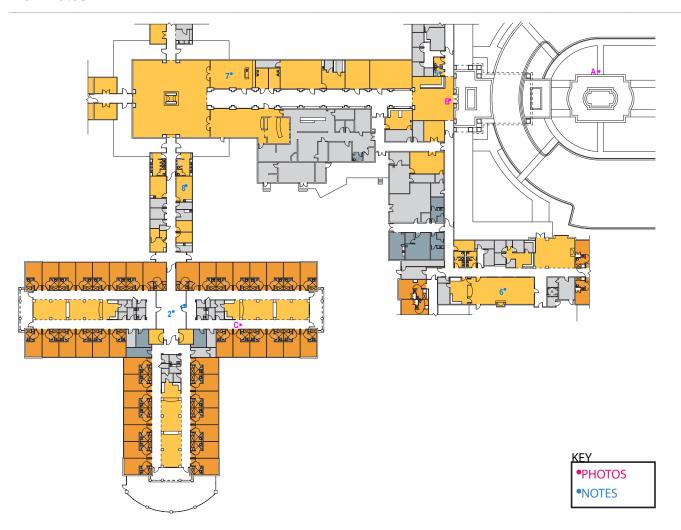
Plan of veterans home complex - Building 3,4 and 6
